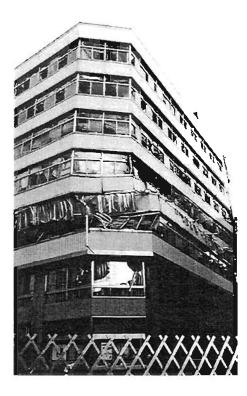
2nd Storey collapse in 7 storey corner building
